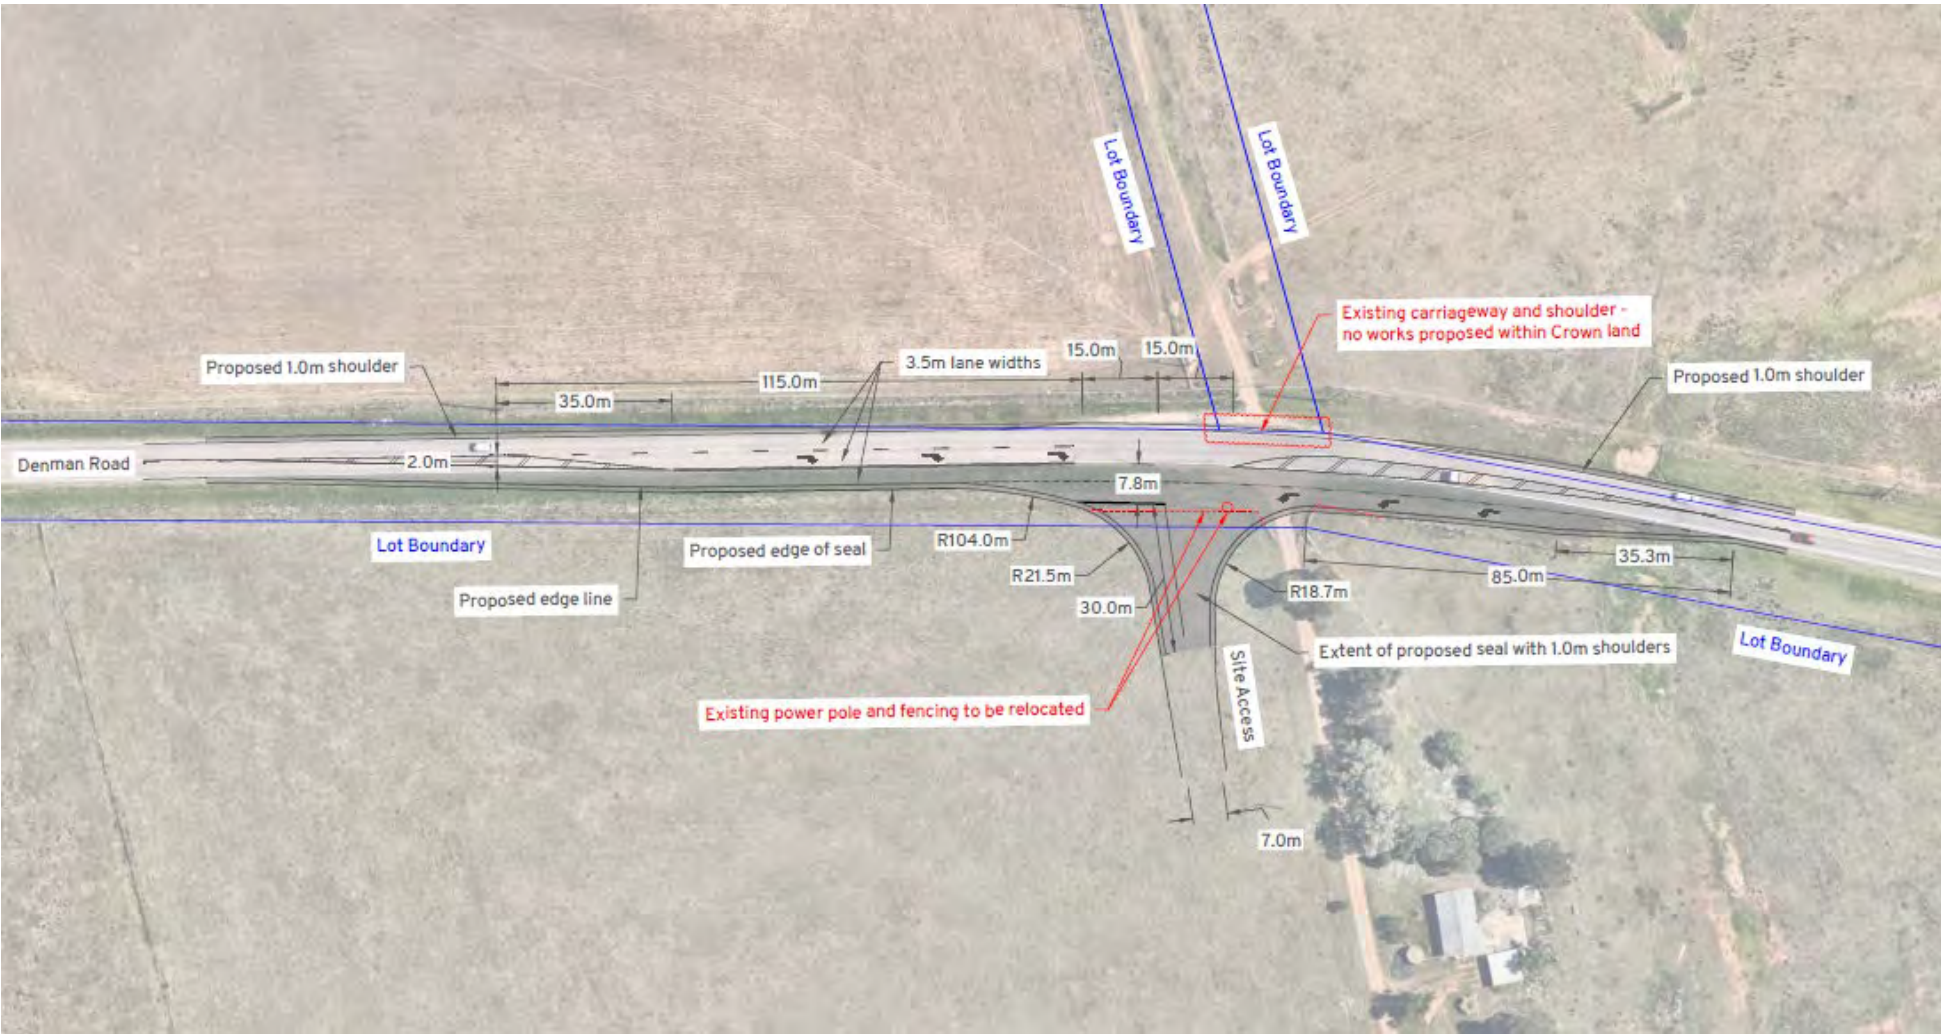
PROPOSED SITE ACCESS DESIGN
